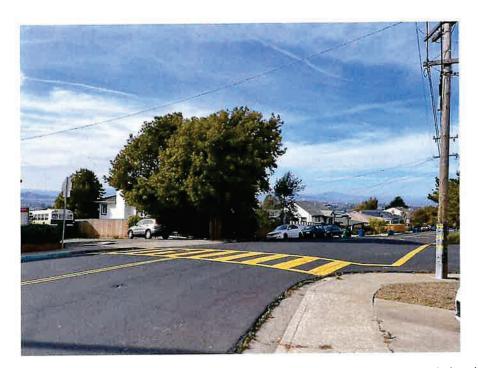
The crosswalk crossing Arlington Boulevard at the intersection of Arlington Blvd and Elm Ave, with the Arlington Christian School parking lot on the left.
